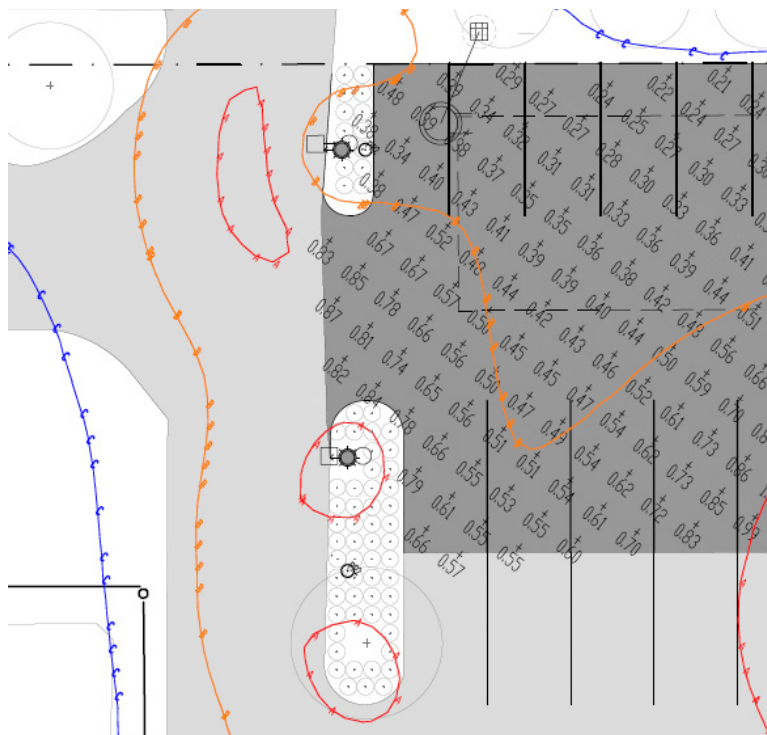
Light distribution of the existing fixtures provides light along the access road and parking areas. See Sheet L-102 for the full site lighting plan.
